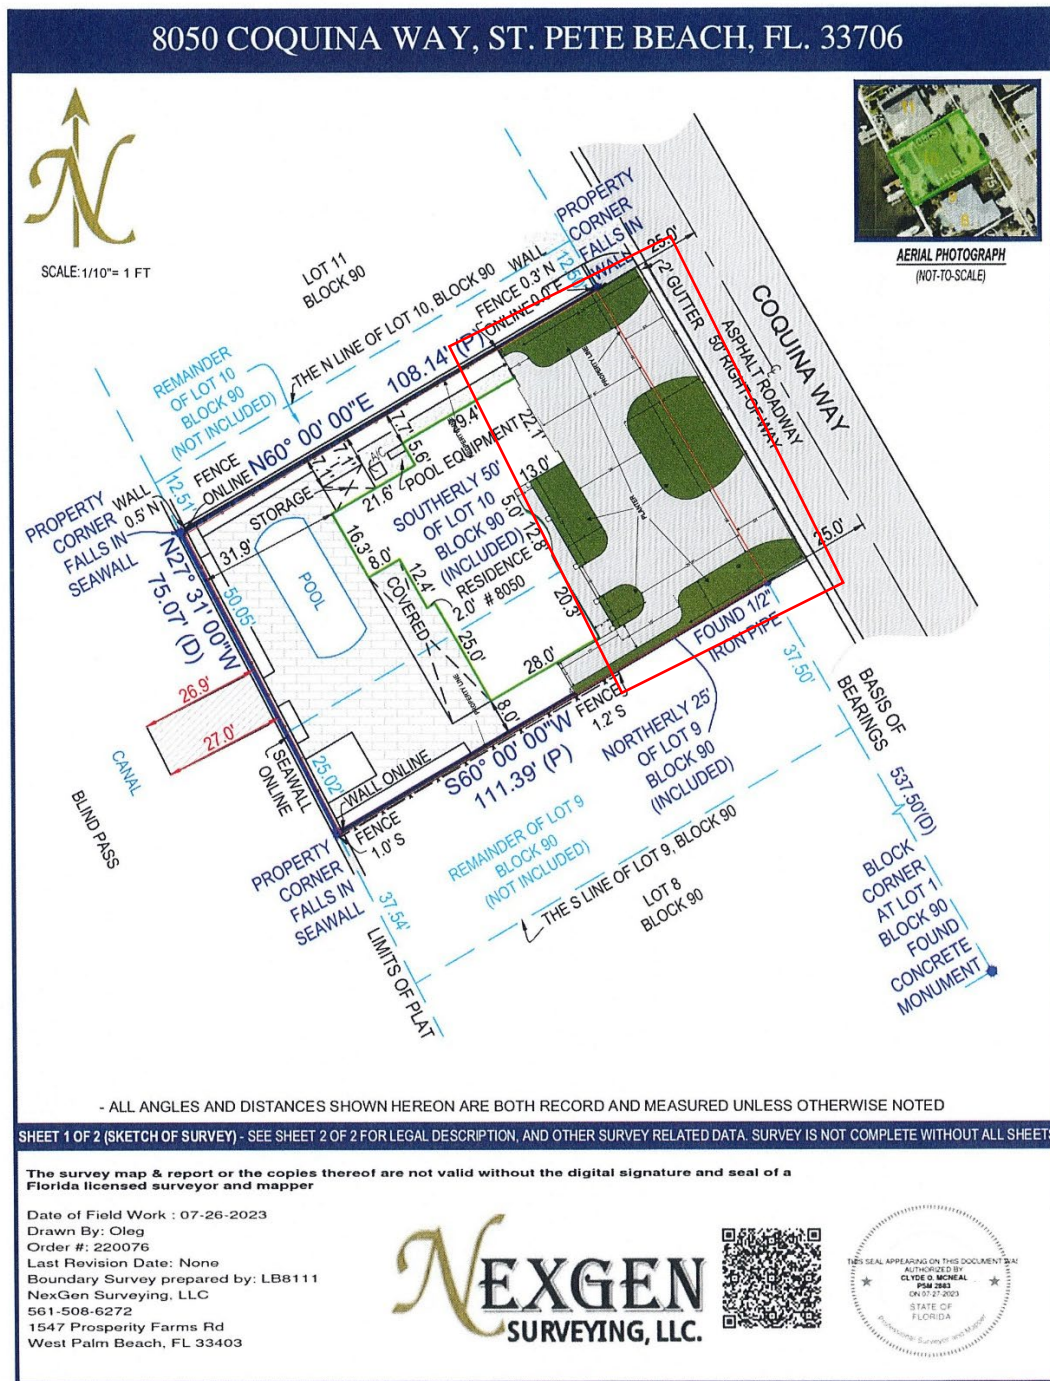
Site Plan with Proposed Driveway Layout (N.T.S.)
